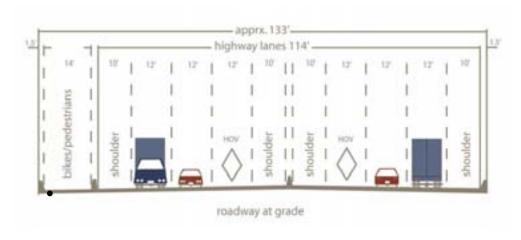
6-Lane Alternative Roadway Cross Section
